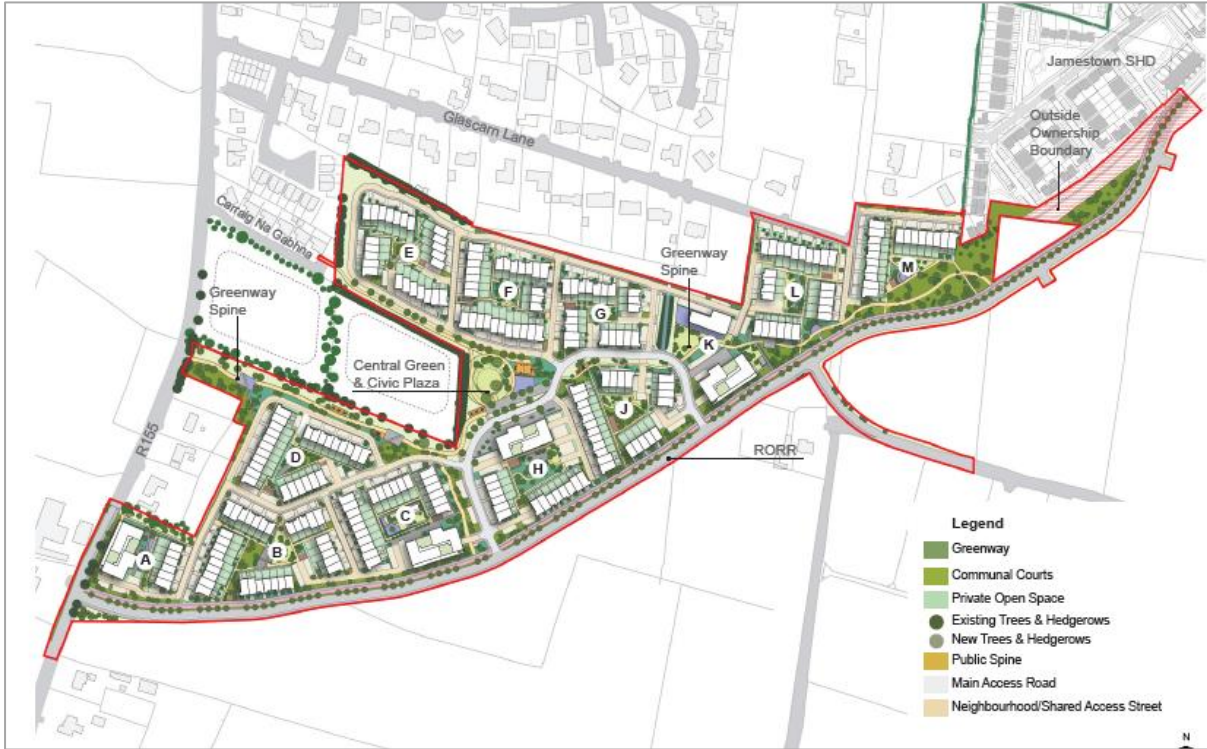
Site layout showing location of Ratoath Outer Relief Road (RORR)
